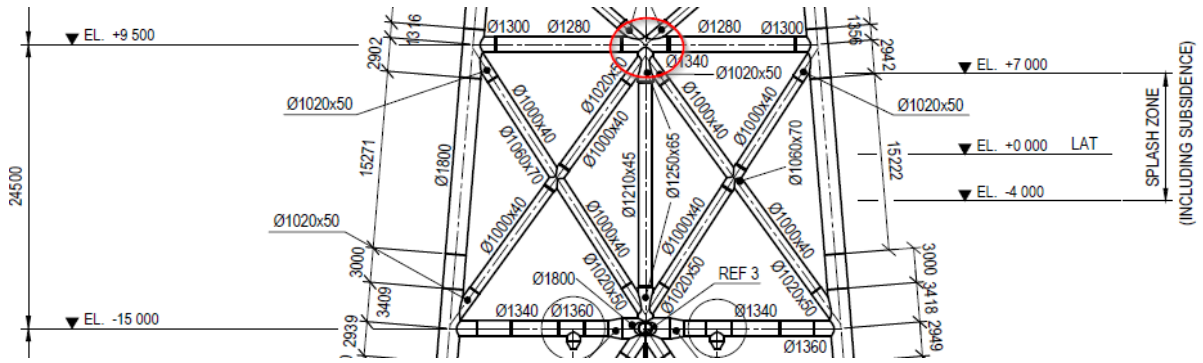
Elevation of grid 1 showing elevations +9.5 and +15m with joint nr.73
